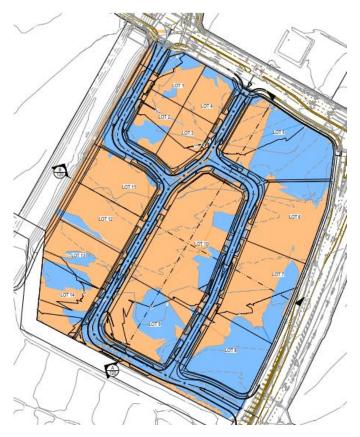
Bulk Earthworks Design Plan 30031846-1194-120 (SMEC 19/09/2024)
